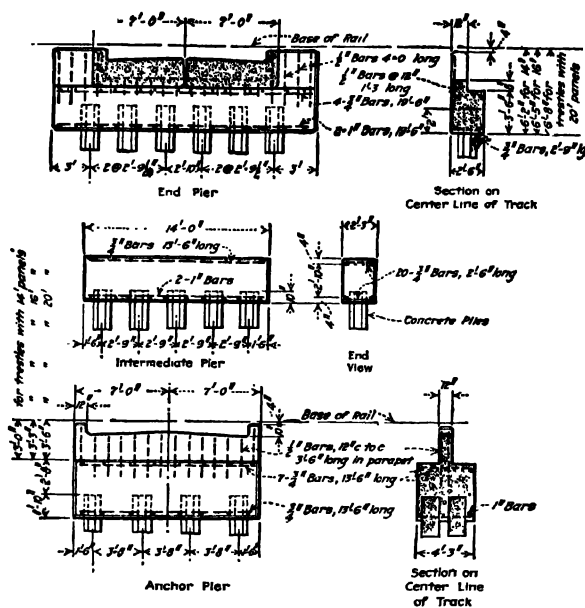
Details of substructure, standard concrete pile trestle, Illinois Central R. R.
